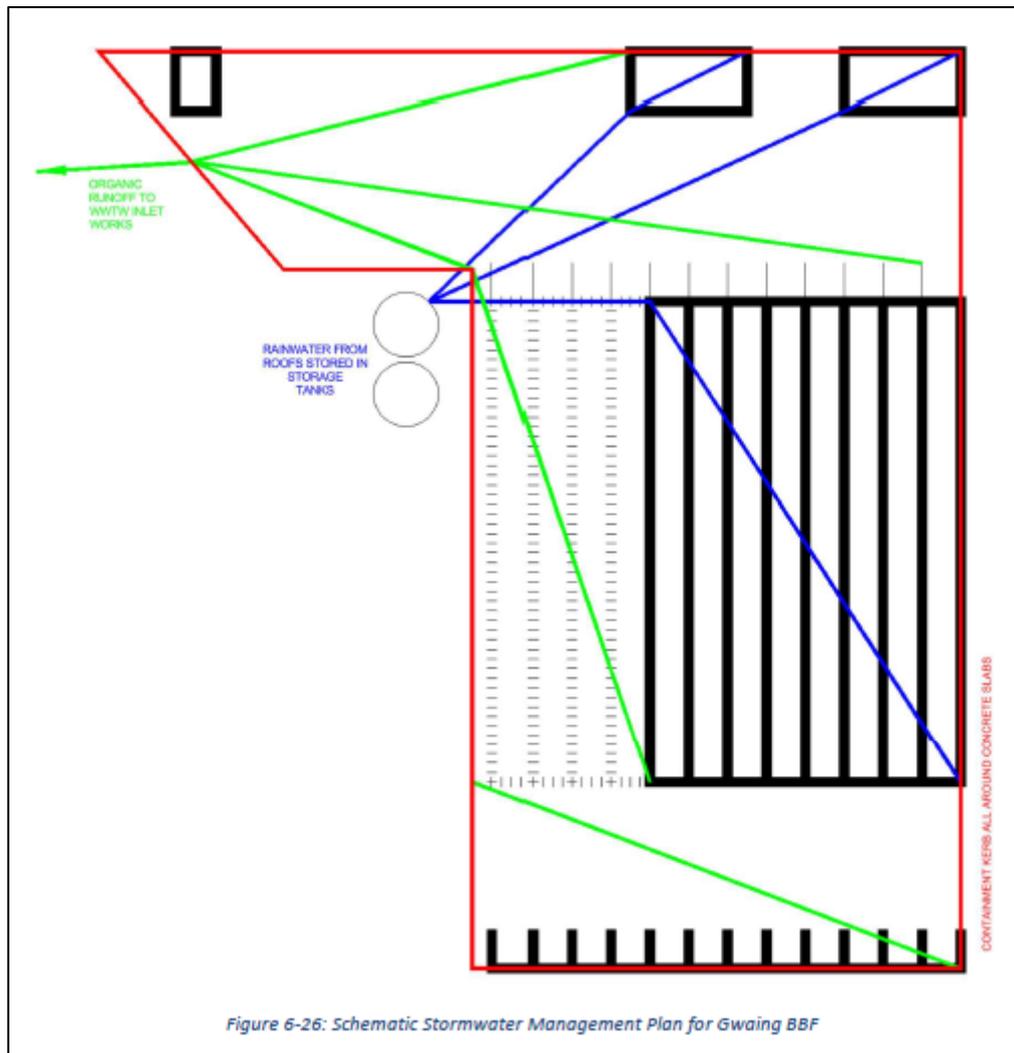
Schematic stormwater management plan for Gwaing BBF from Engineering Design Report
